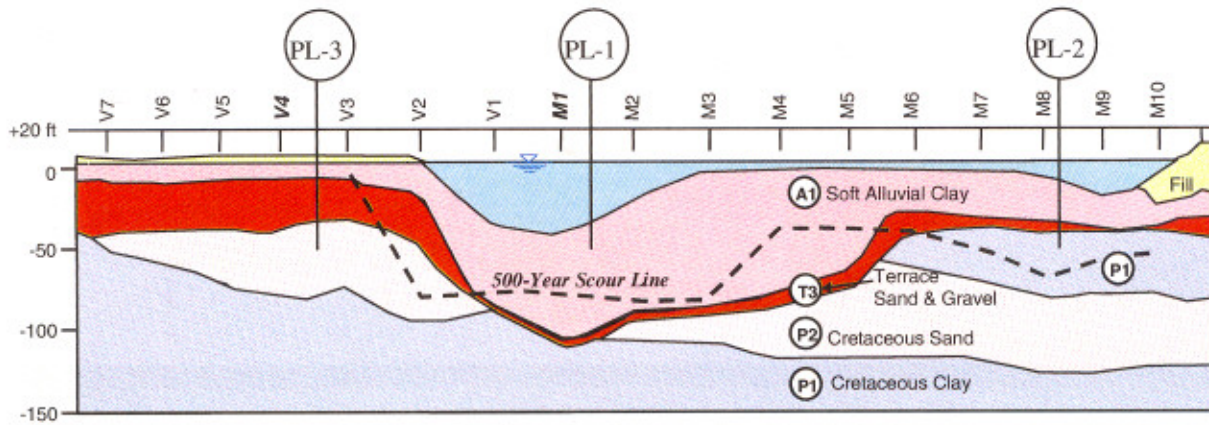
Soil and estimated scour profile, bridge pier locations, and pile load test locations.
